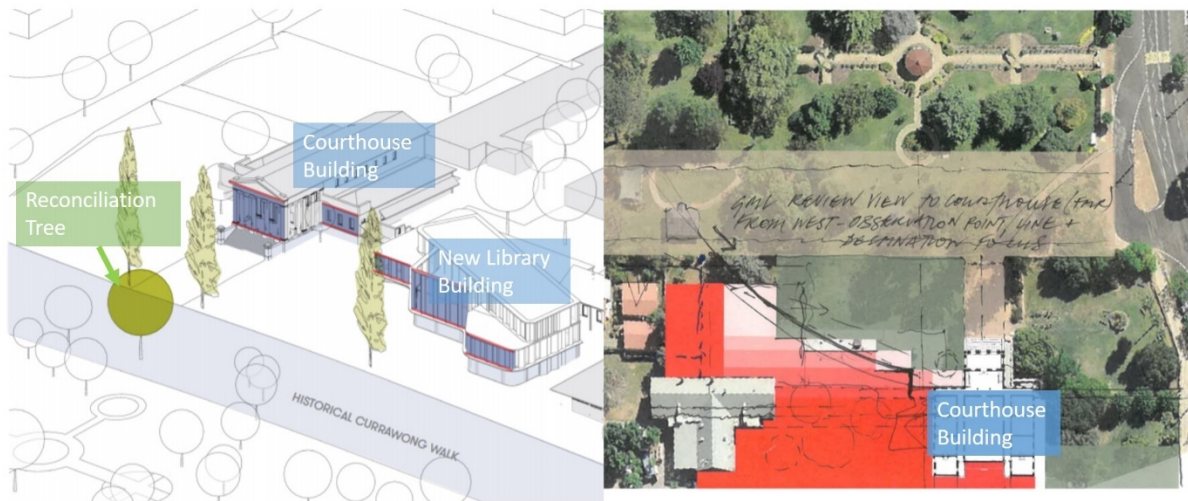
| Views to and from the former Court House (Source: Applicant's EIS)
